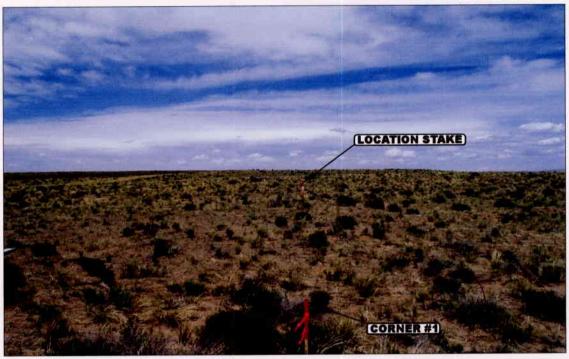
PHOTO: VIEW FROM CORNER #1 TO LOCATION STAKE
